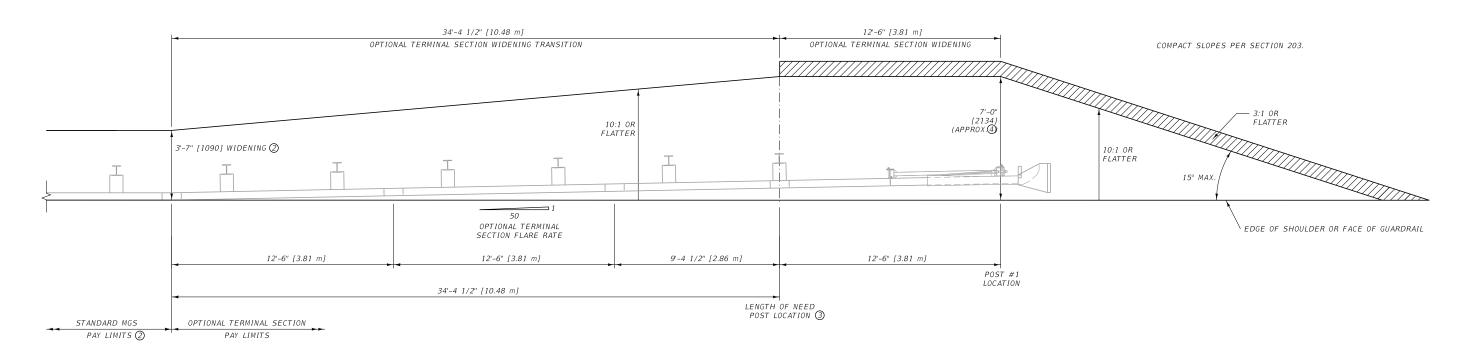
DETAILED DRAWING REFERENCE DWG. NO. STANDARD SPEC. SECTION 606 606-11B
